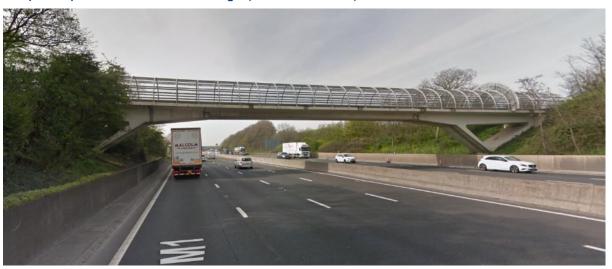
Snapethorpe Accommodation Bridge viewed from the south (source: Google Streetview, August 2020)
